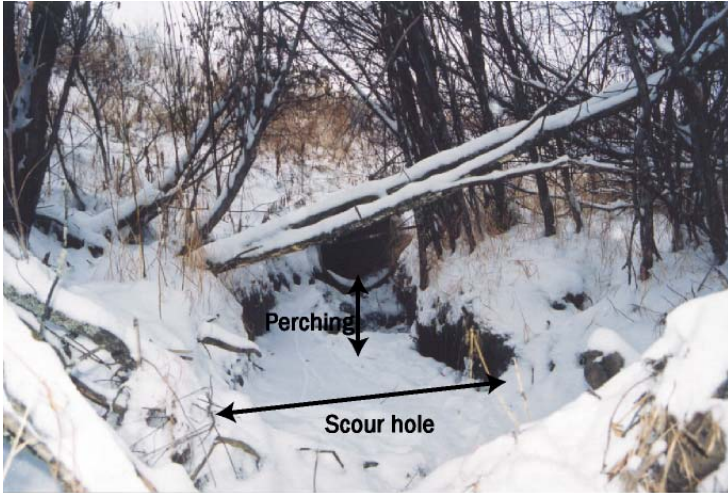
View of culvert outlet downstream of road. Note large scour hole immediately downstream of culvert (November 12/2002).
